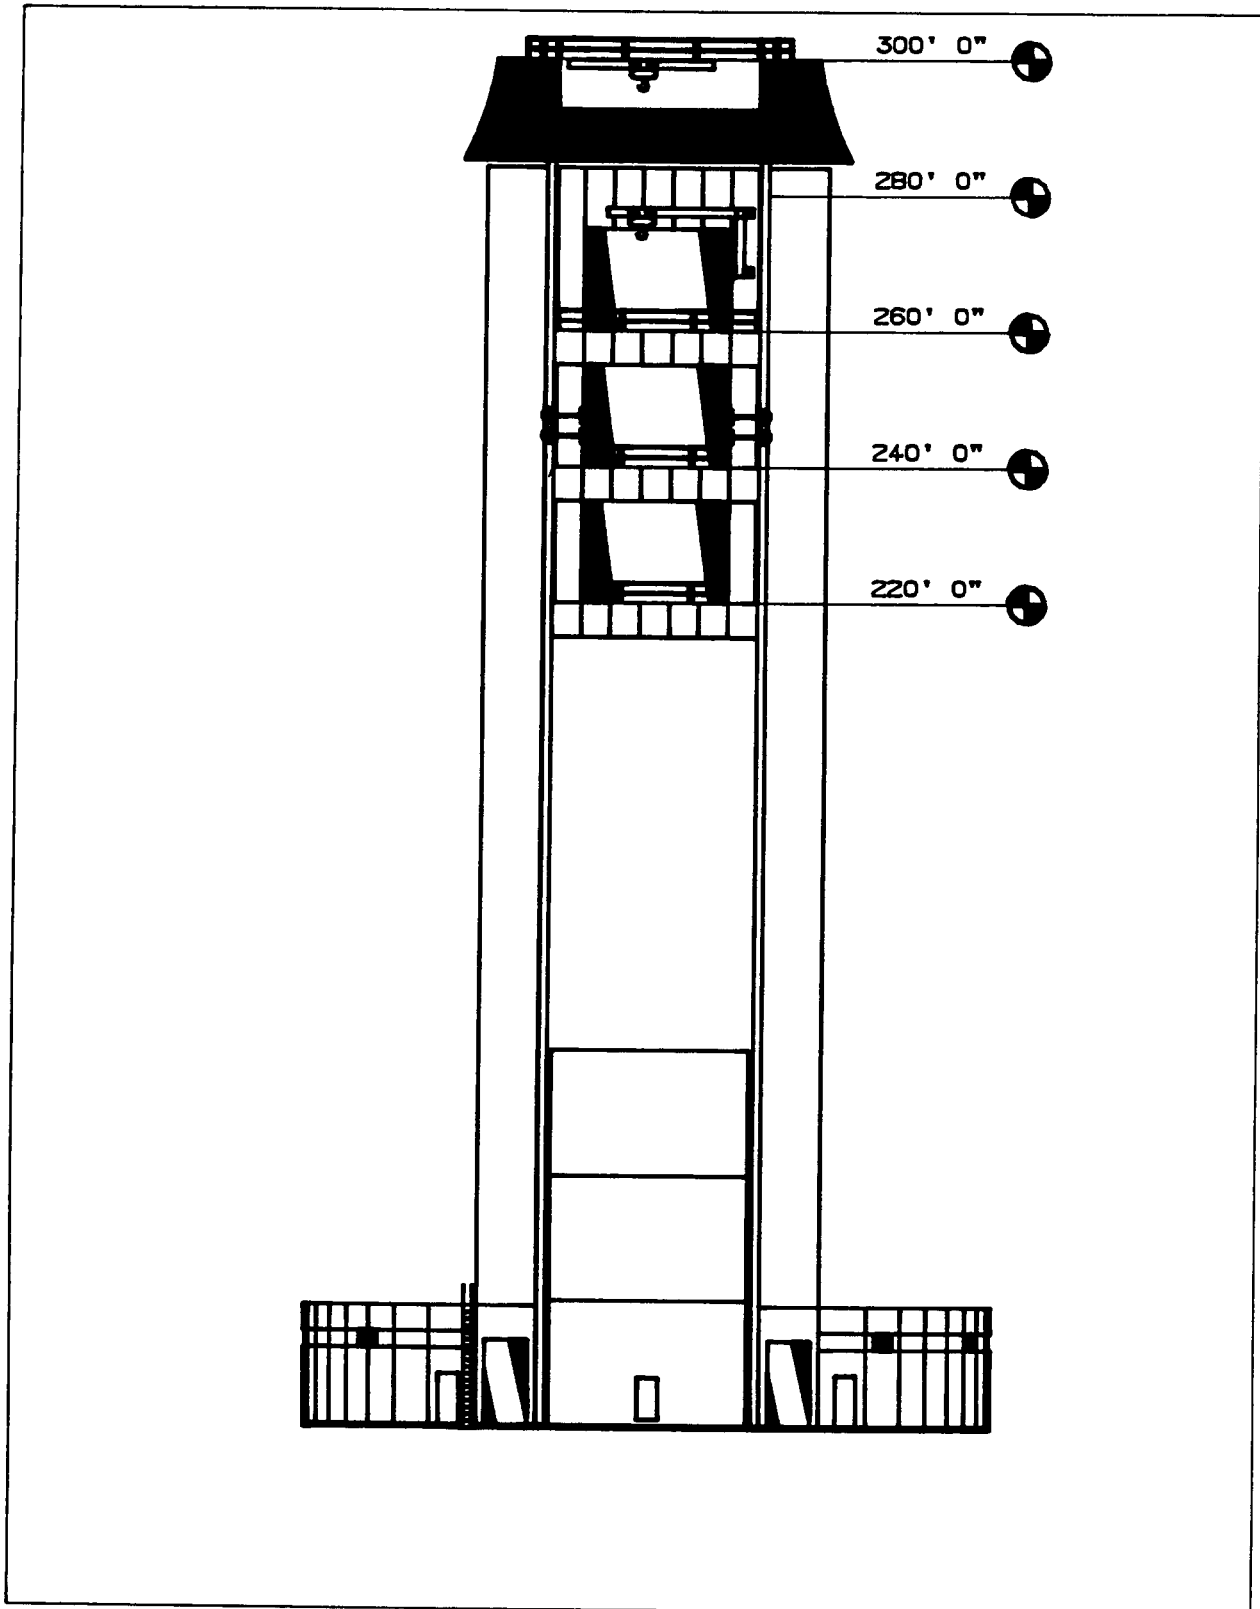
North Elevation of CRTF Tower Showing Test Bay Locations
